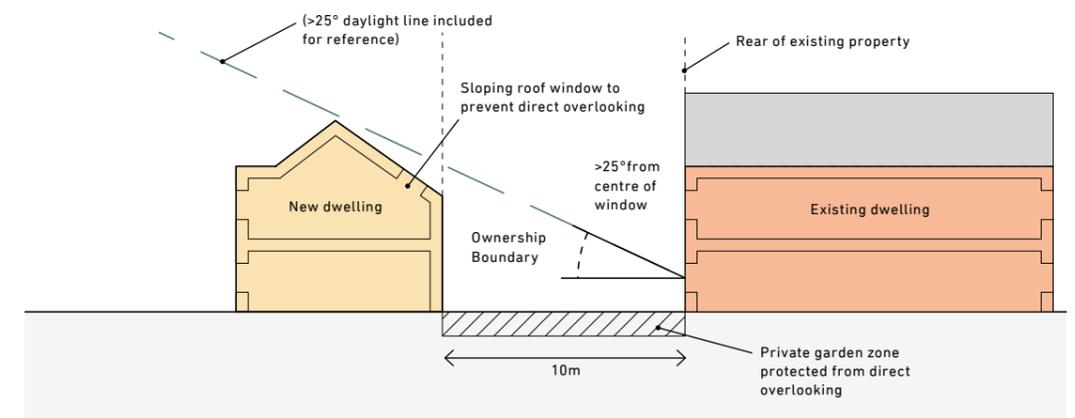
The use of sloping roof windows can help avoid direct overlooking of neighbouring gardens
